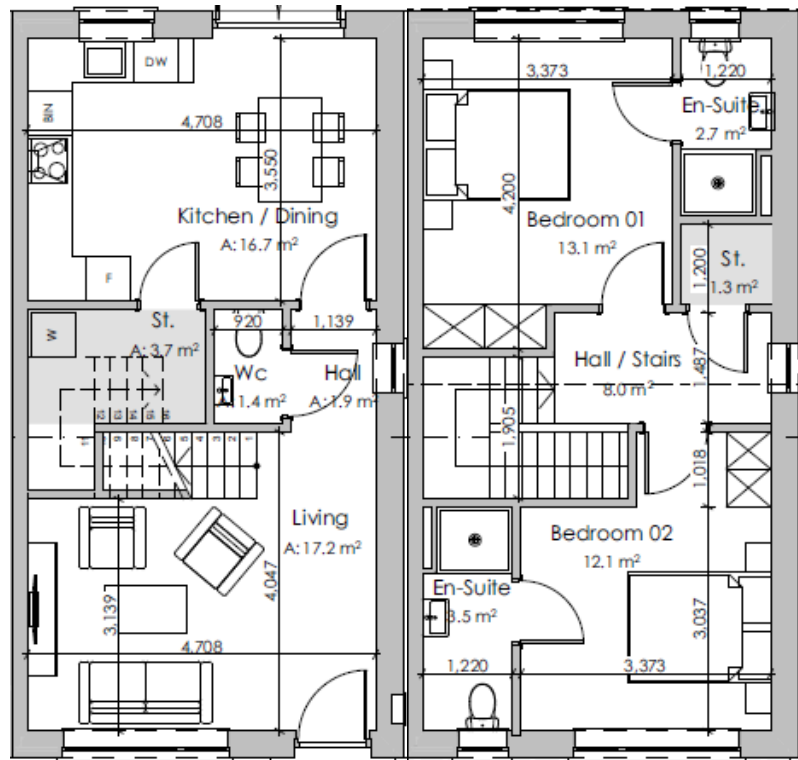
Ground (l) and first (r) floor plans of House Type 2.5.
